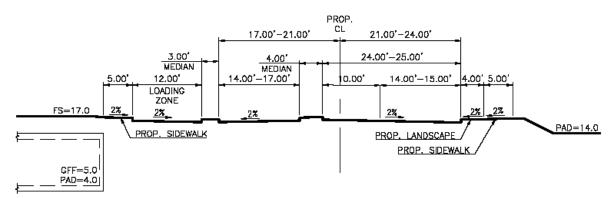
Lodge Entry Road at the Lodge Drop-Off Section C
